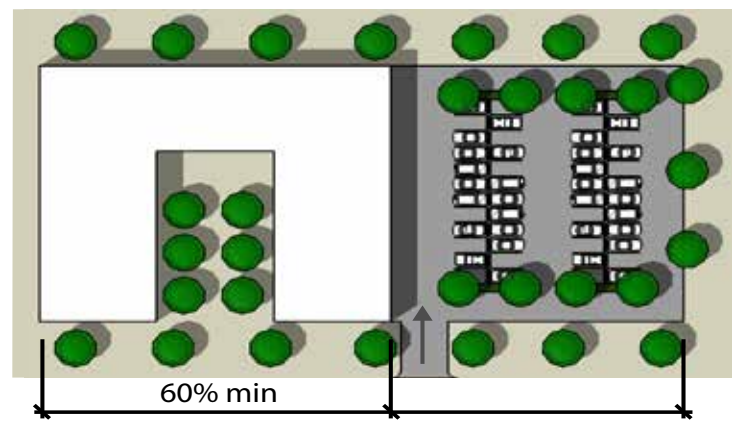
S1.b: Minimum street frontage for buildings with a central courtyard that opens to the street.
